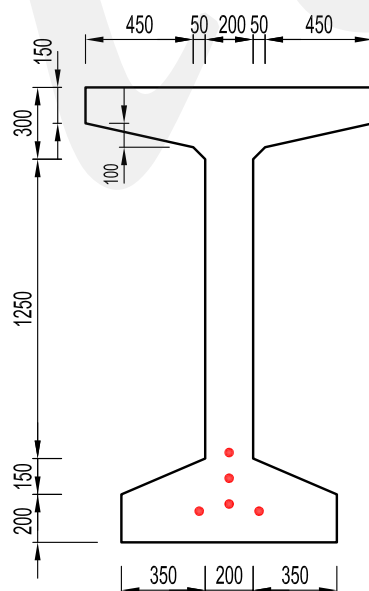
Cross-section dimensions of precast concrete girder All dimensions are in centimeters. 1 cm = 0.3937 in.
